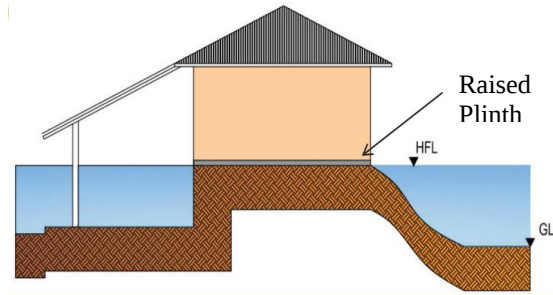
Plinth Level Raised by Creating an Elevated Ground
